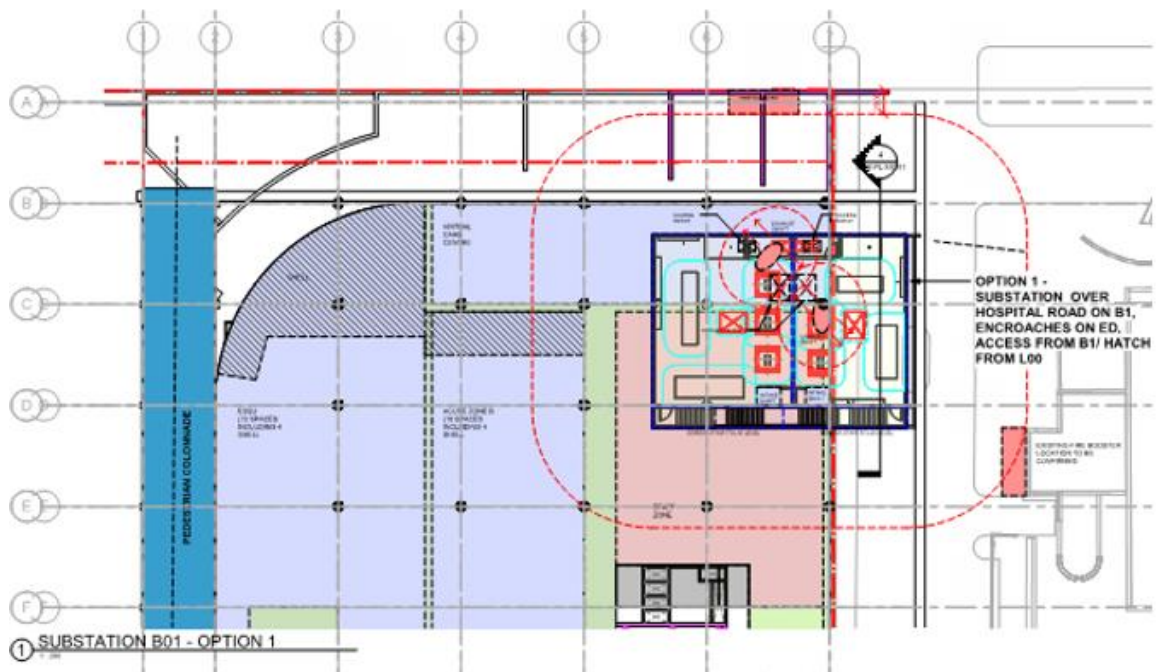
Proposed Basement Chamber Location Plans and Access Strategy
